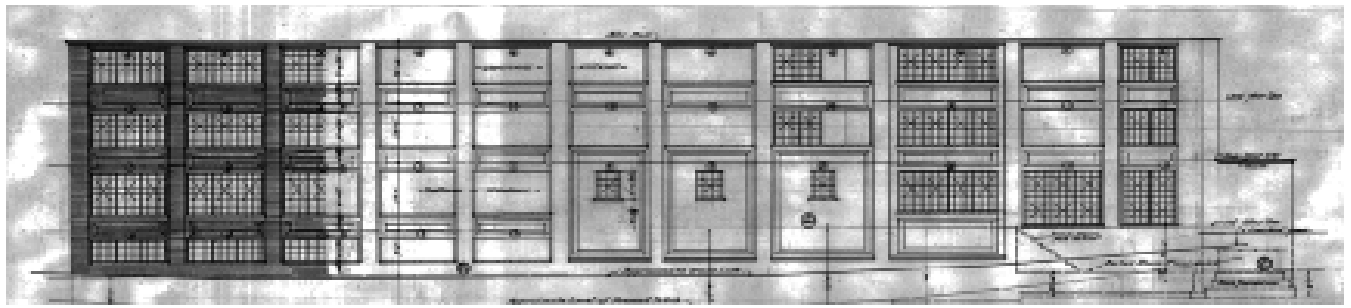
West Elevation, Plan for Spaulding Factory Building #5 (1910). Courtesy Drake Community Library
